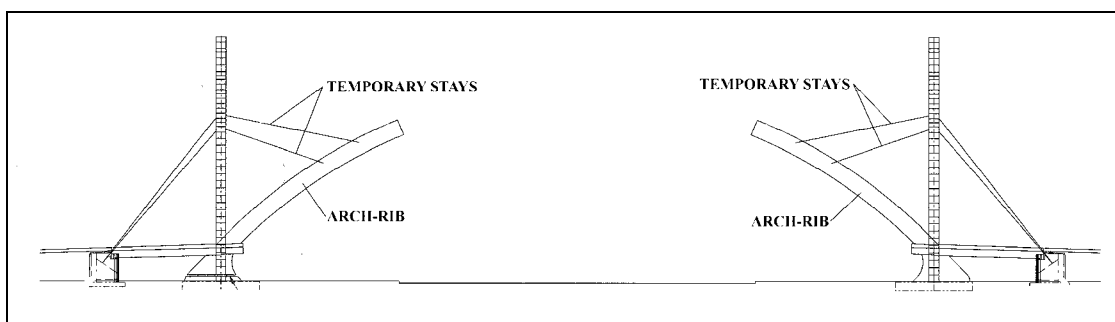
Step 2-Construct Arch (Modified IRIB Specifications and Construction Plans)
